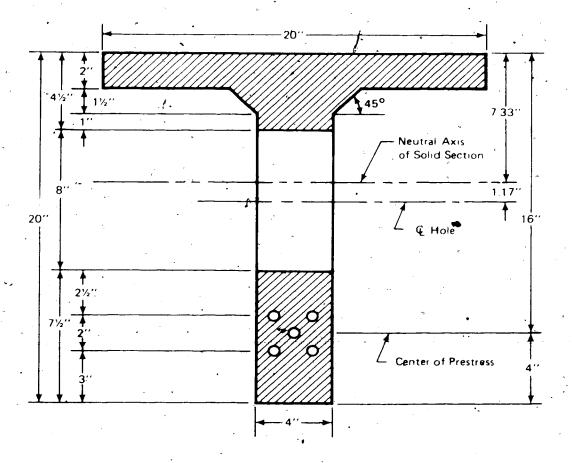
Typical Concrete Cross Section at an Opening
